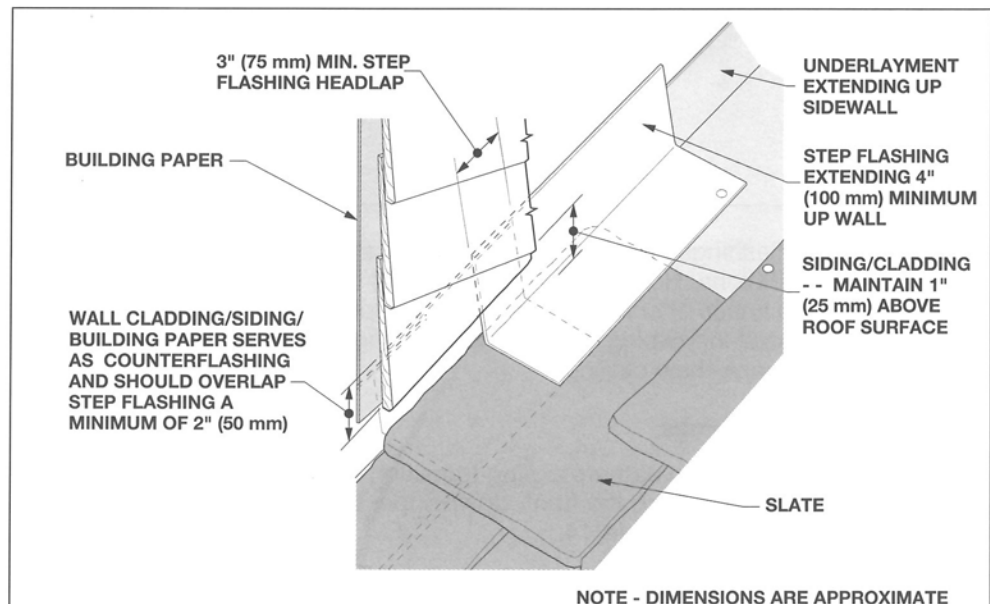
Step flashing at the intersection of a sloping roof and vertical wall
